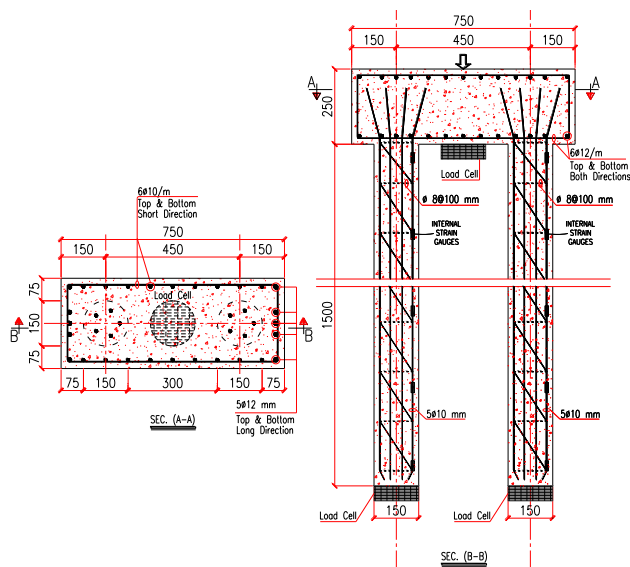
Concrete Dimension and Reinforcement for Group (2) – Two Piles
